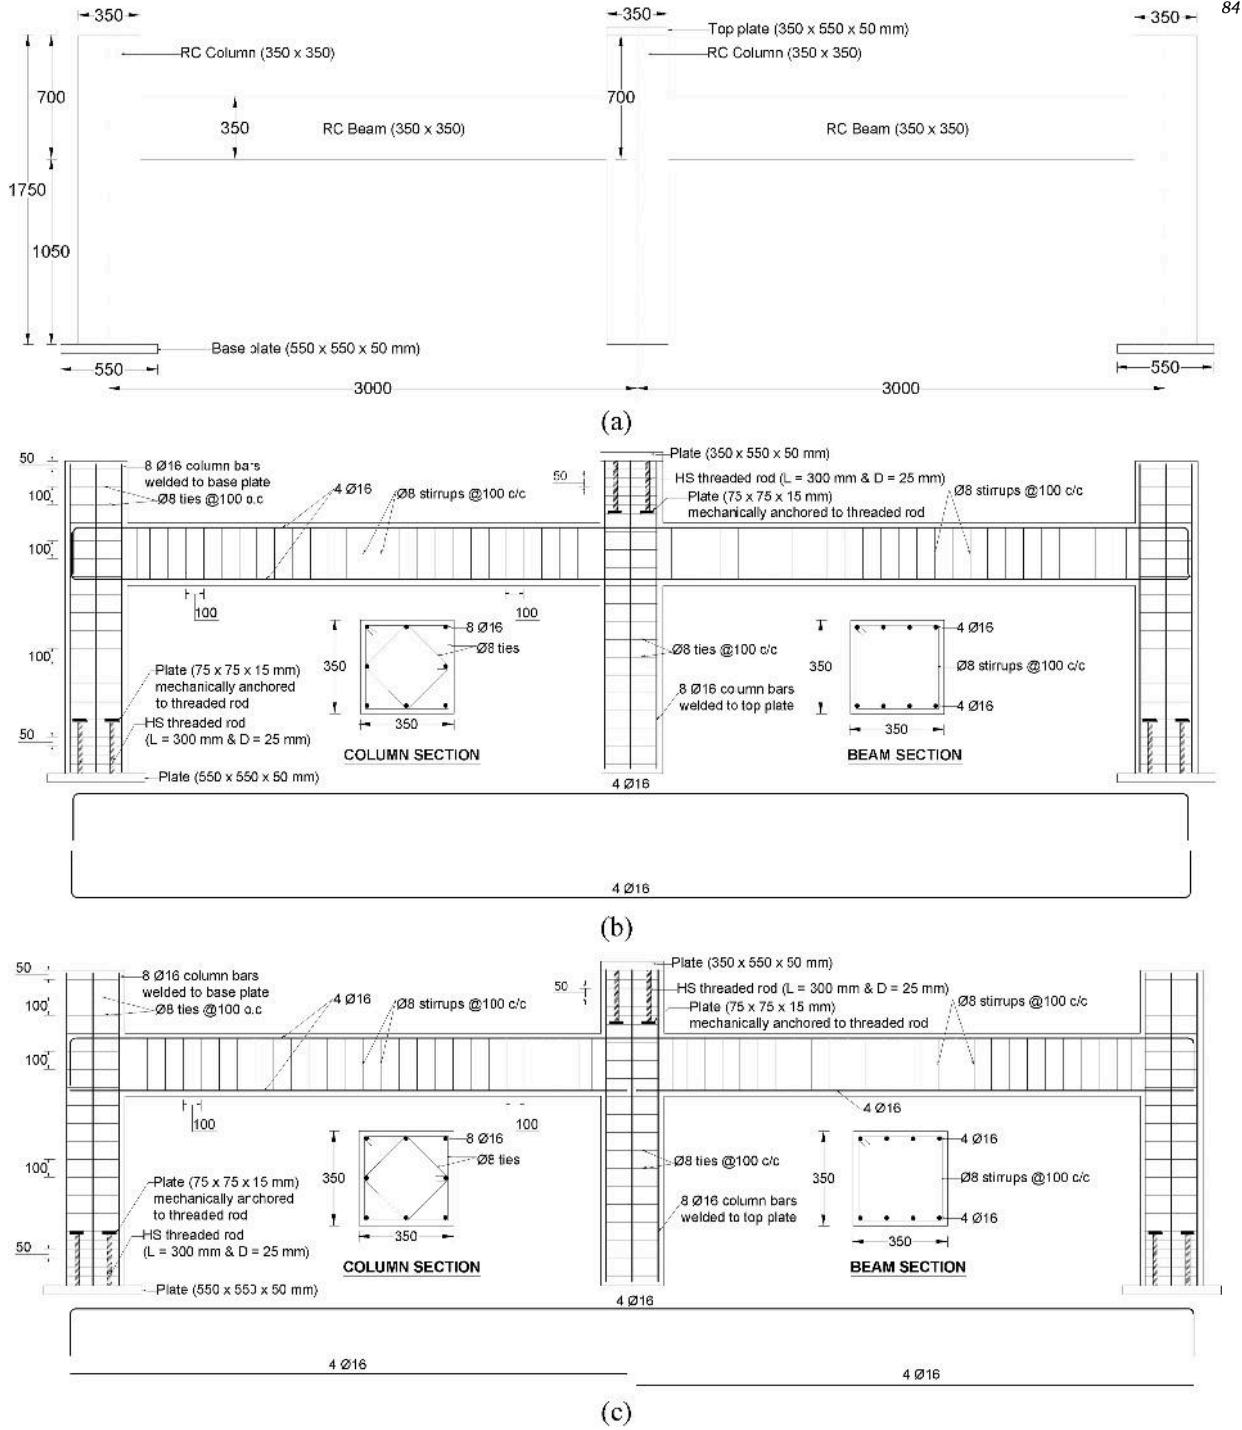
Details of monolithic assemblies M-CBR and M-DBR [36,37] (Dimensions are measured in mm): (a) Concrete dimensions; (b) Reinforcement for M-CBR; (c) Reinforcement for M-DBR.
